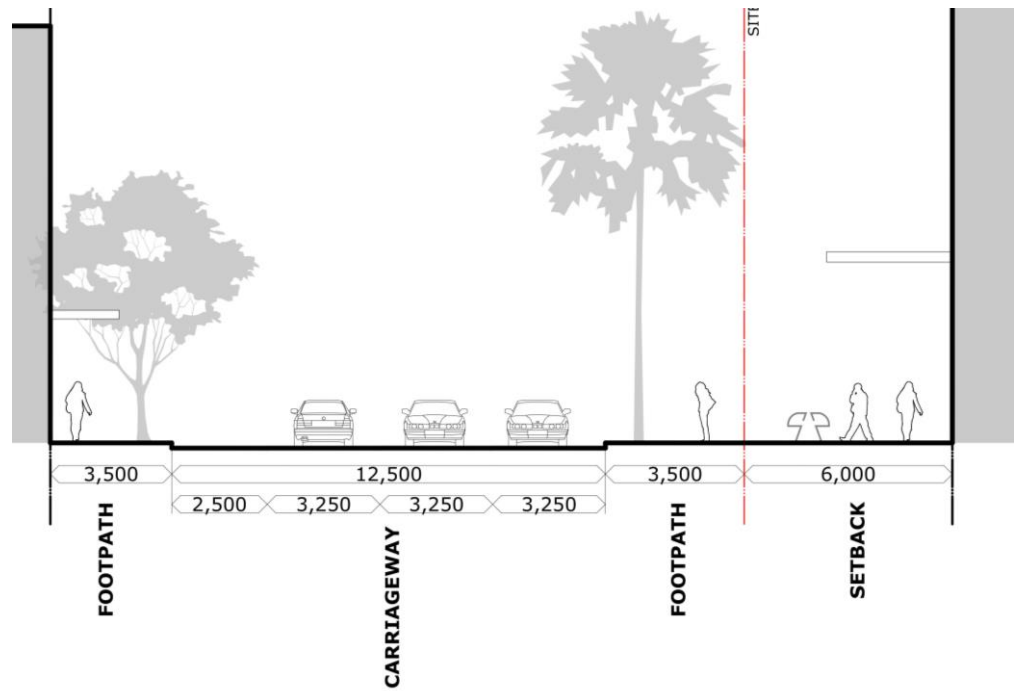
Section A - A – Local Street Typical Section – Raglan Street
